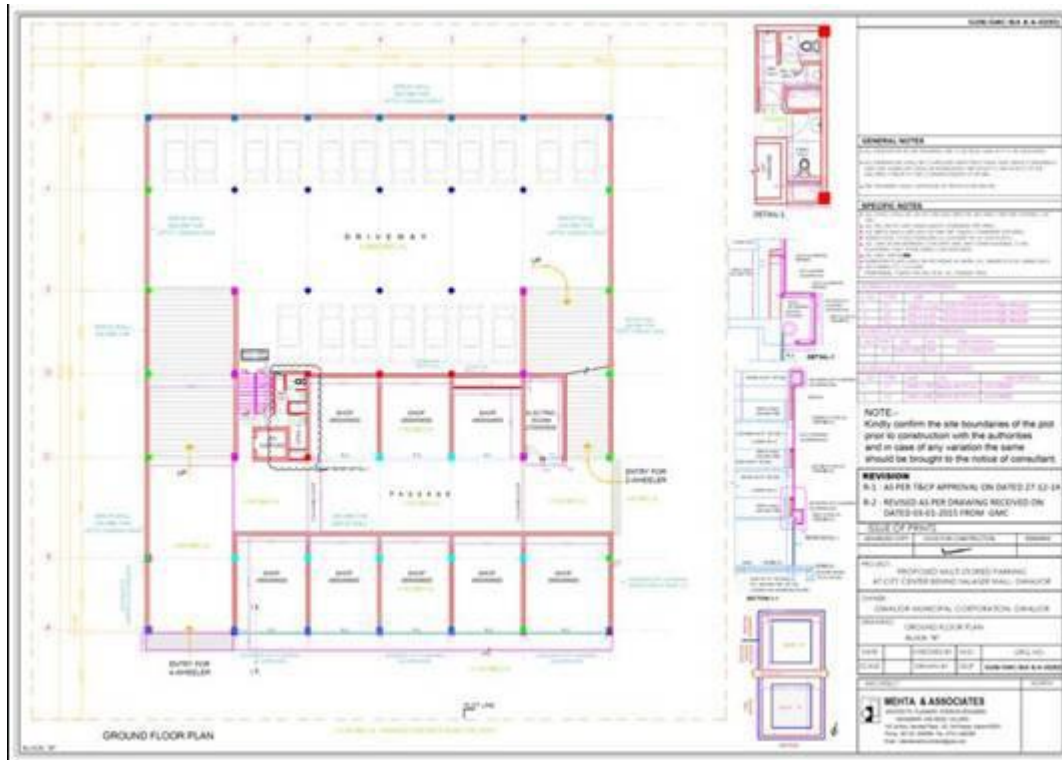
Parking Location: Salasar MultiLevel Parking (Ground Floor-Block B)
